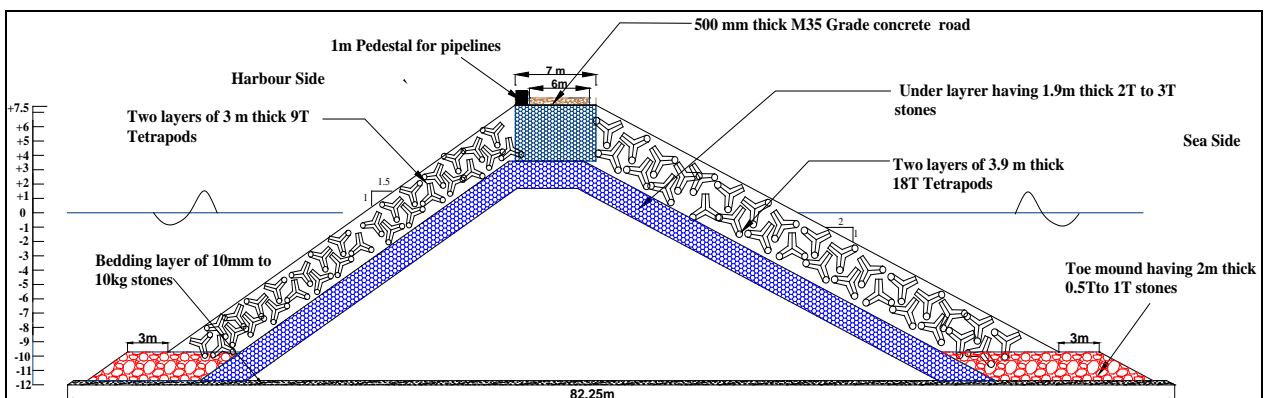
Typical breakwater trunk section for water depth of 10m to 12m
